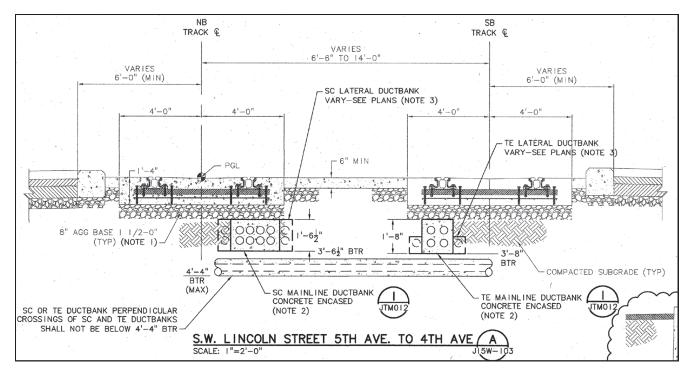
Typical section of Portland-Milwaukie light rail project (Courtesy: TriMet).
